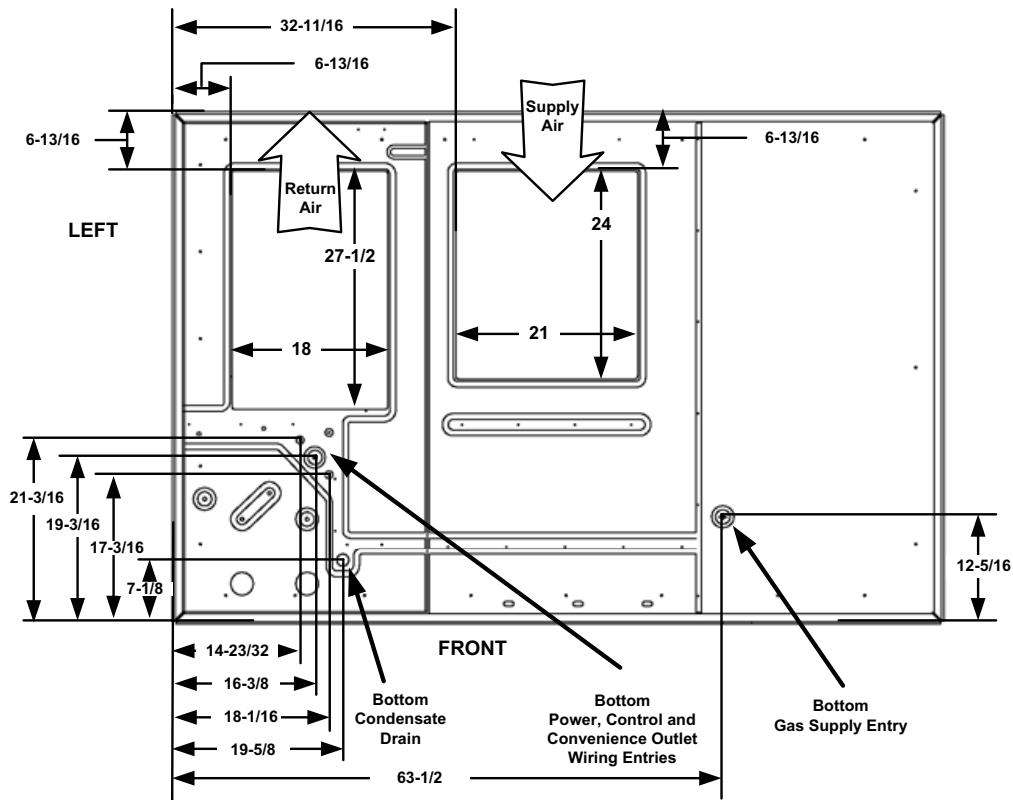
BOTTOM DUCT OPENINGS (FROM ABOVE)
